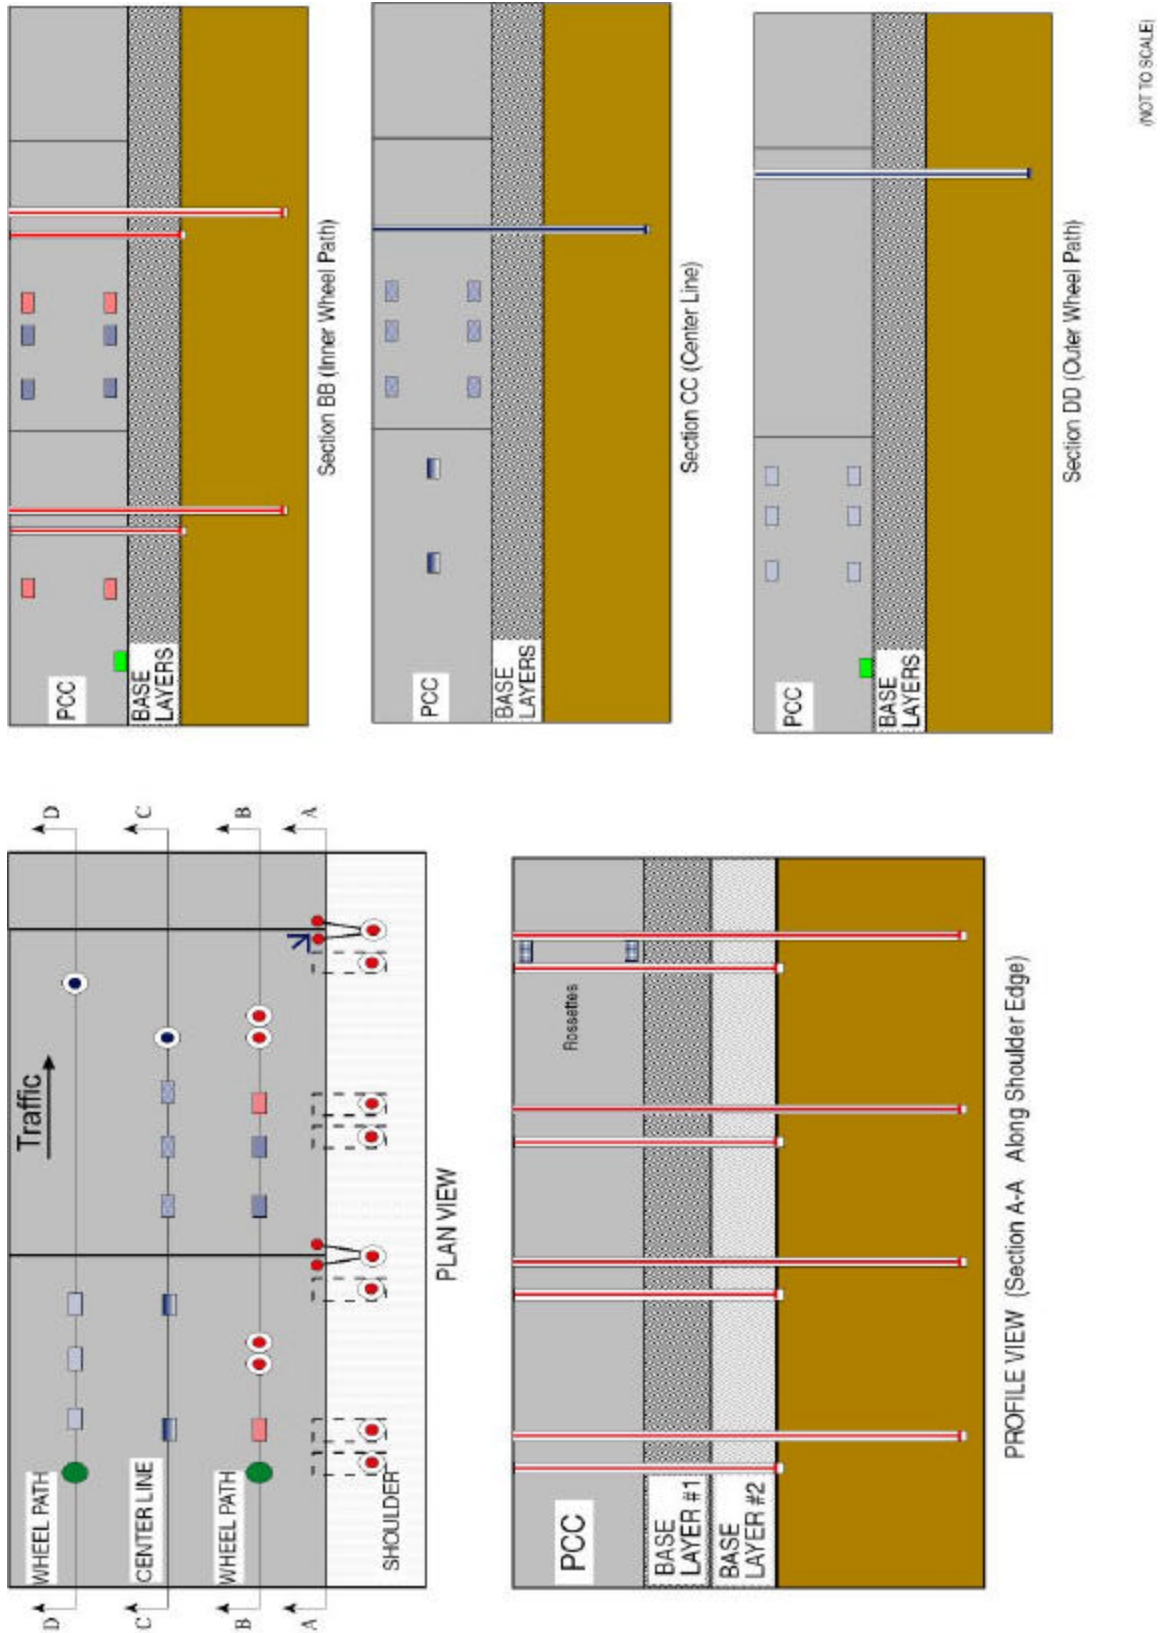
Typical Structural Response Sensor Placement in PCC Test Sections
